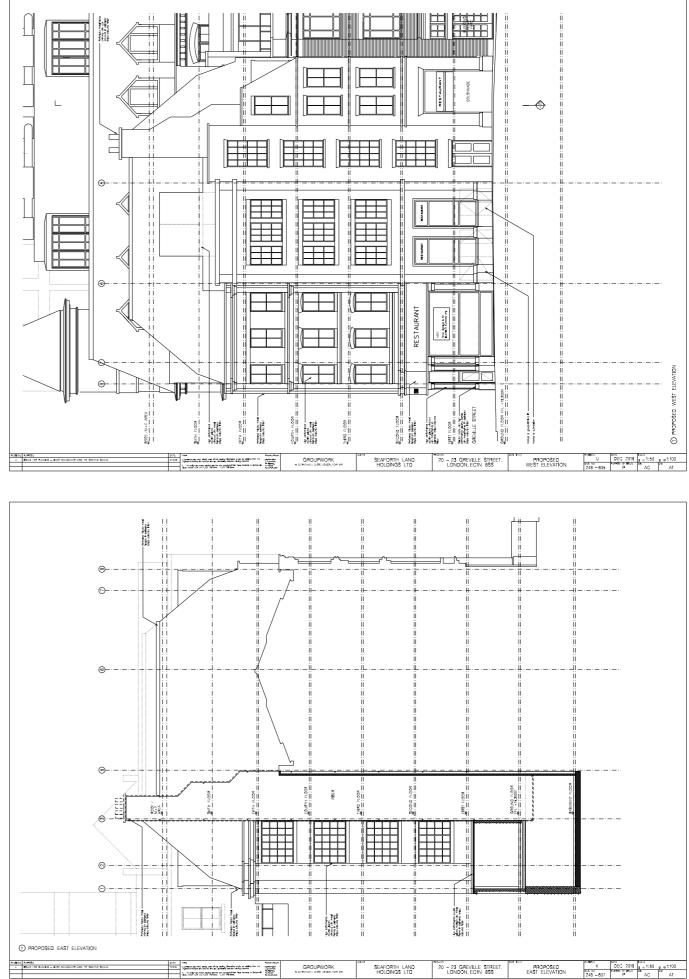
Planning approved west (left top) and east (left bottom) elevations (ref; 2018/0910/P).
